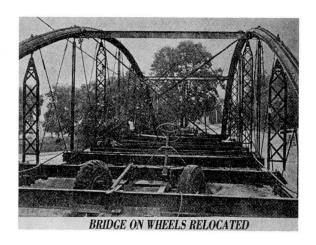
Espyville Road Bridge (1873), a bowstring arch-truss fabricated by the Wroght Iron Bridge Company of Canton, Ohio, was braced, lifted from its abutments, placed on a wheeled under carriage, and driven to a new location over the Olentangy River near Caledonia, Ohio - an unusual, but simple alternative to demolition.
